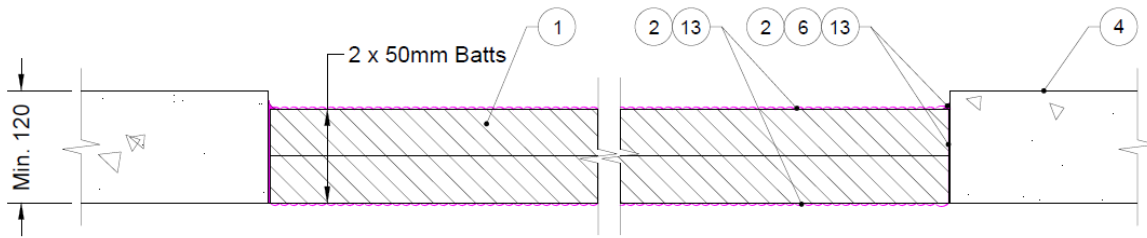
Support Floor Construction for PROMASEAL® Bulkhead Batt
